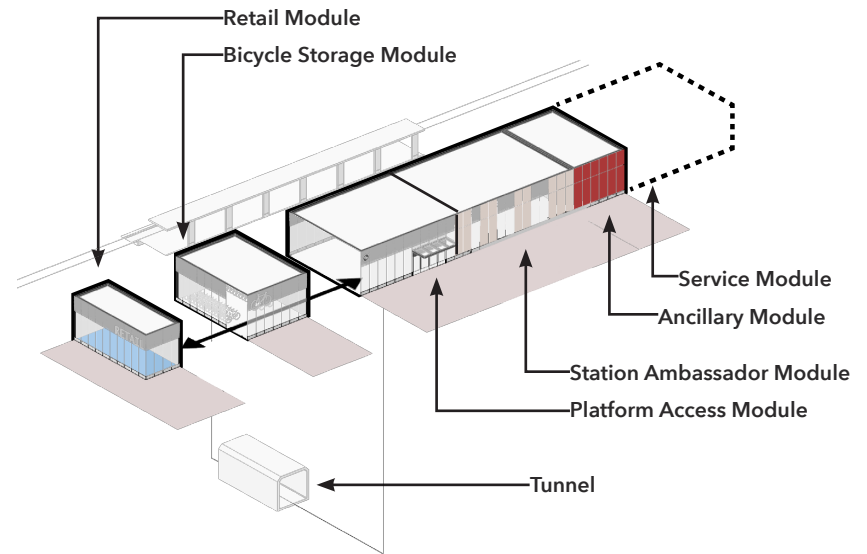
Planning Diagram of a staffed Station Building, illustrating Tunnel Platform Access.
